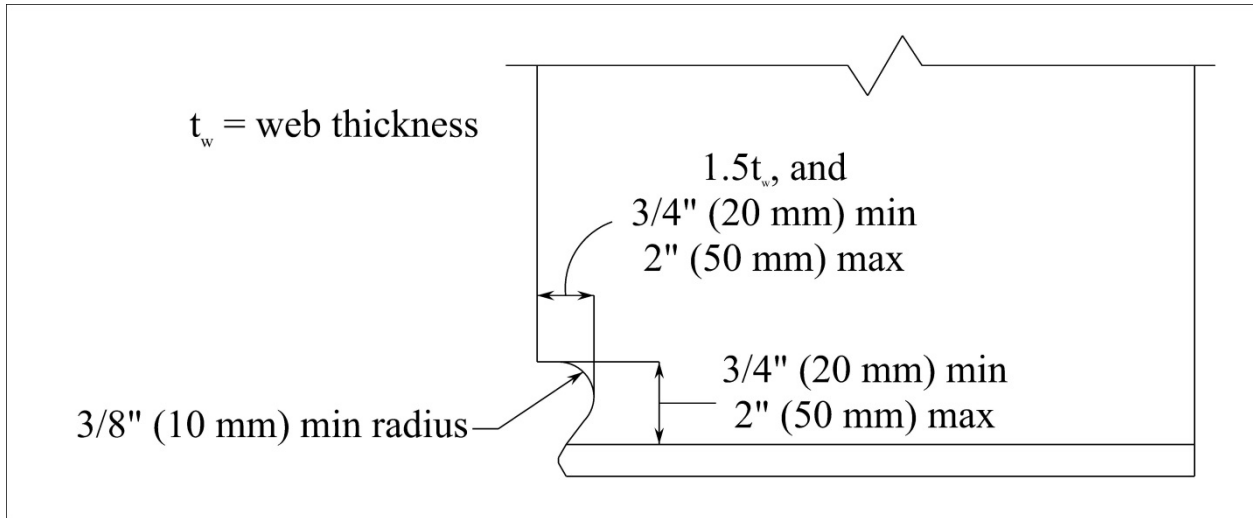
Shop Welded Splice Details
